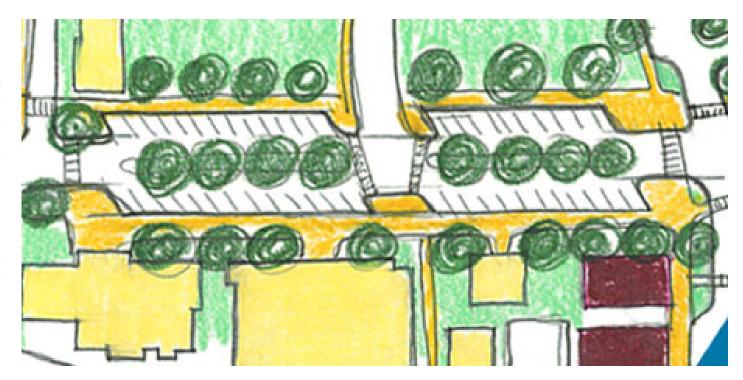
Proposed Layout of Bryan Plaza. Yellow building exist. Maroon buildings are suggested.
